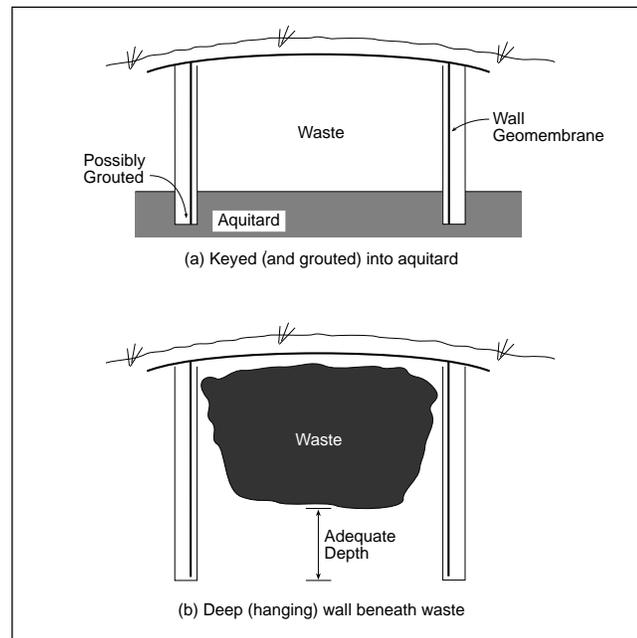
Termination of toe (bottom) of geomembrane vertical barriers
